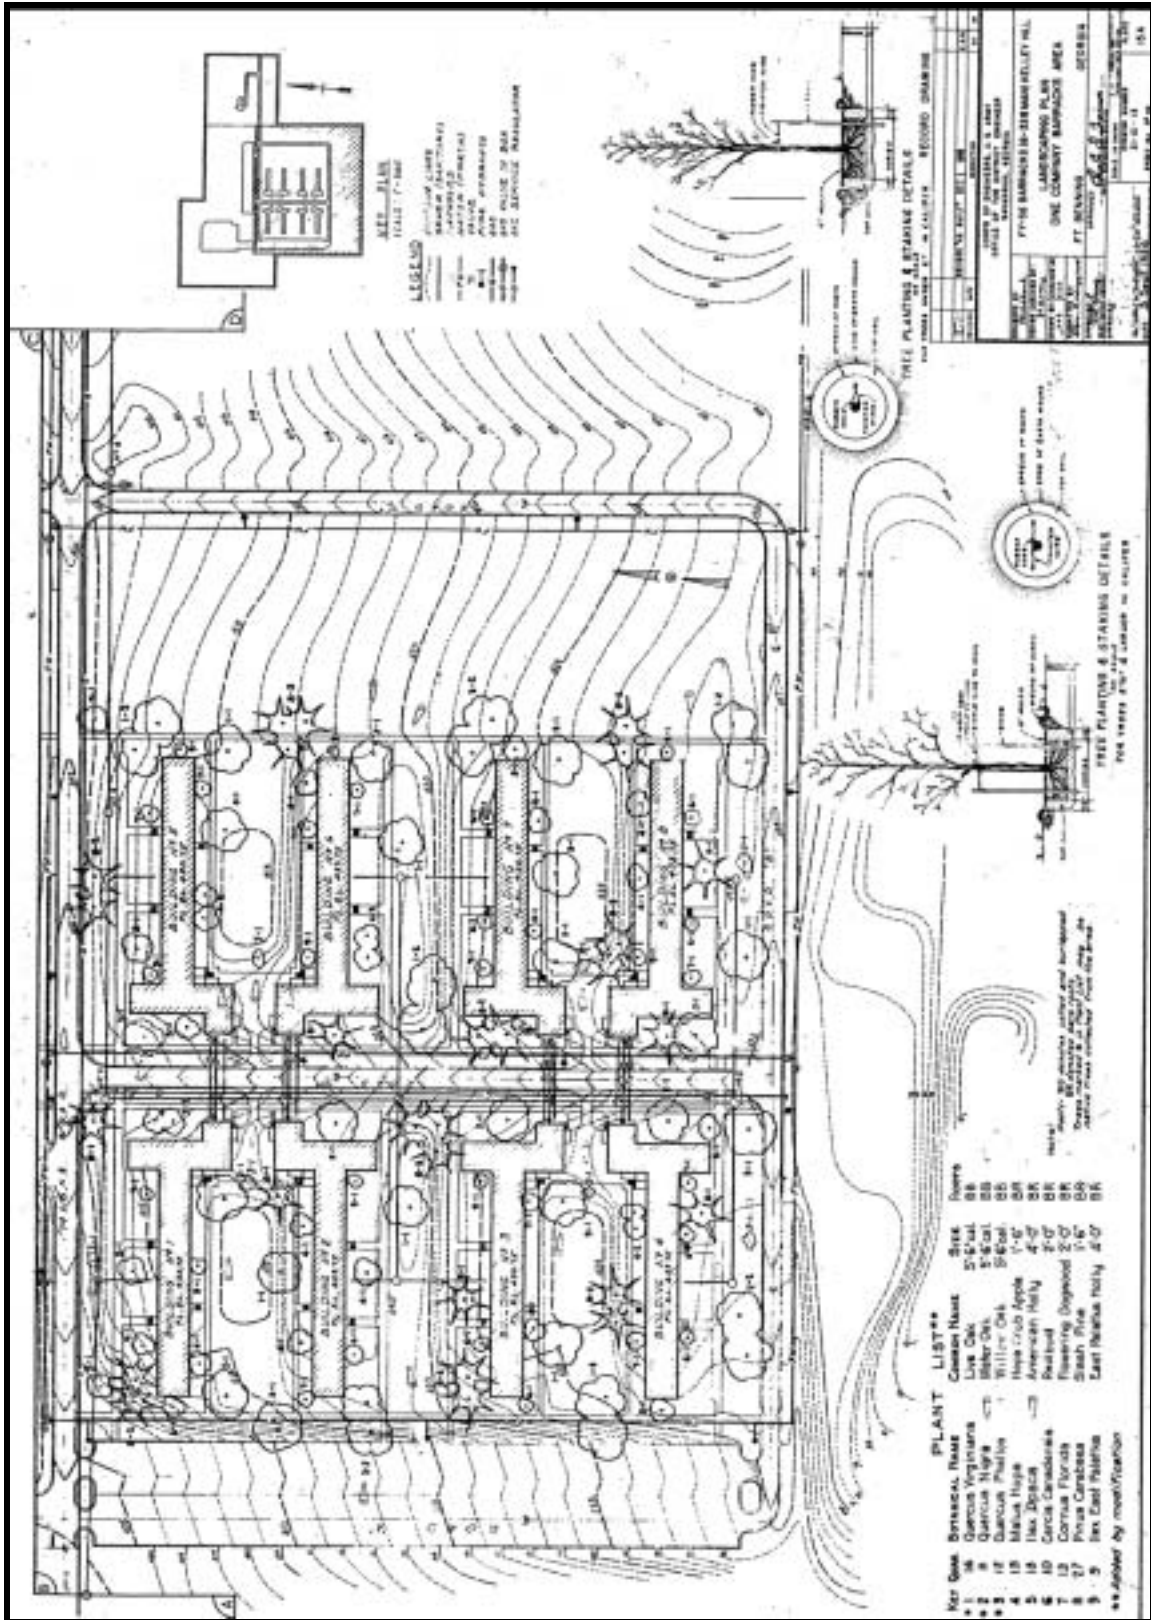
Hammerhead barracks, landscape plan, Ft. Benning (1956, revised 1958) (Engineering, Ft. Benning).
